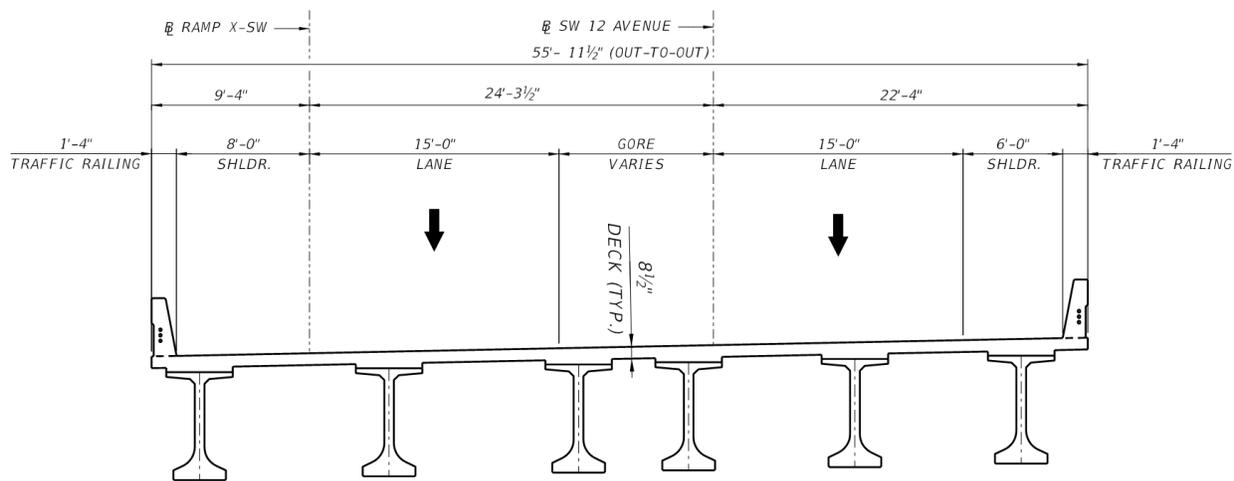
Bridge Typical Section (Bridge No. 6)
